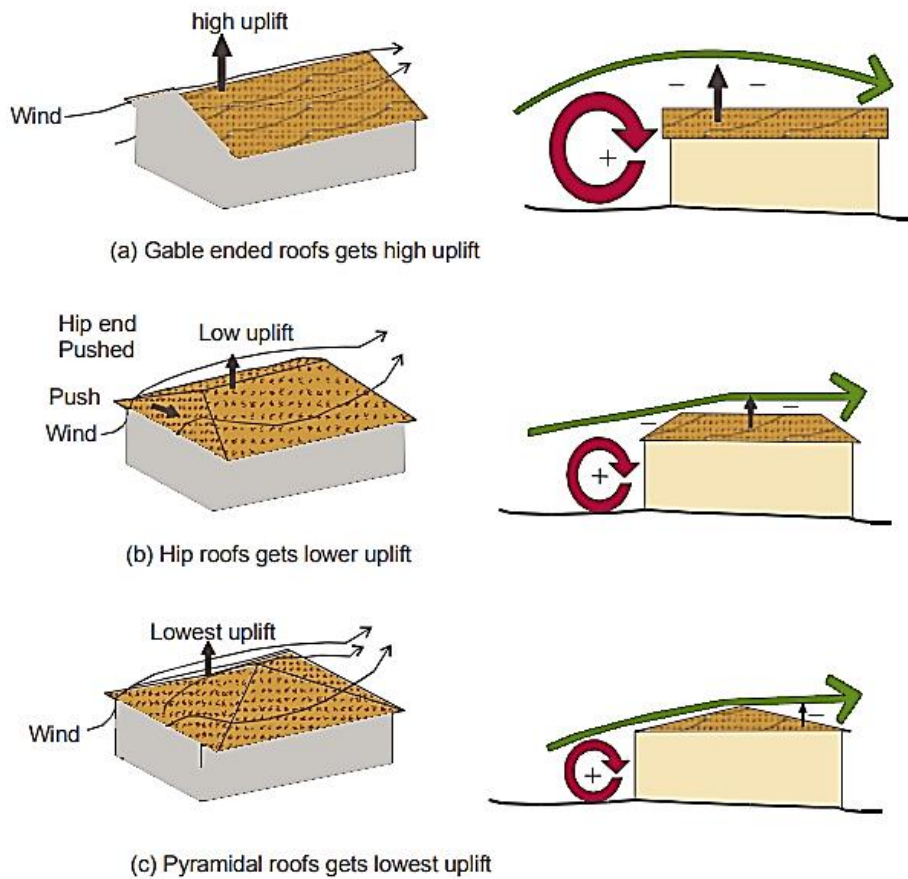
EFFECTS OF ROOF SHAPE ON UPLIFT FORCES
